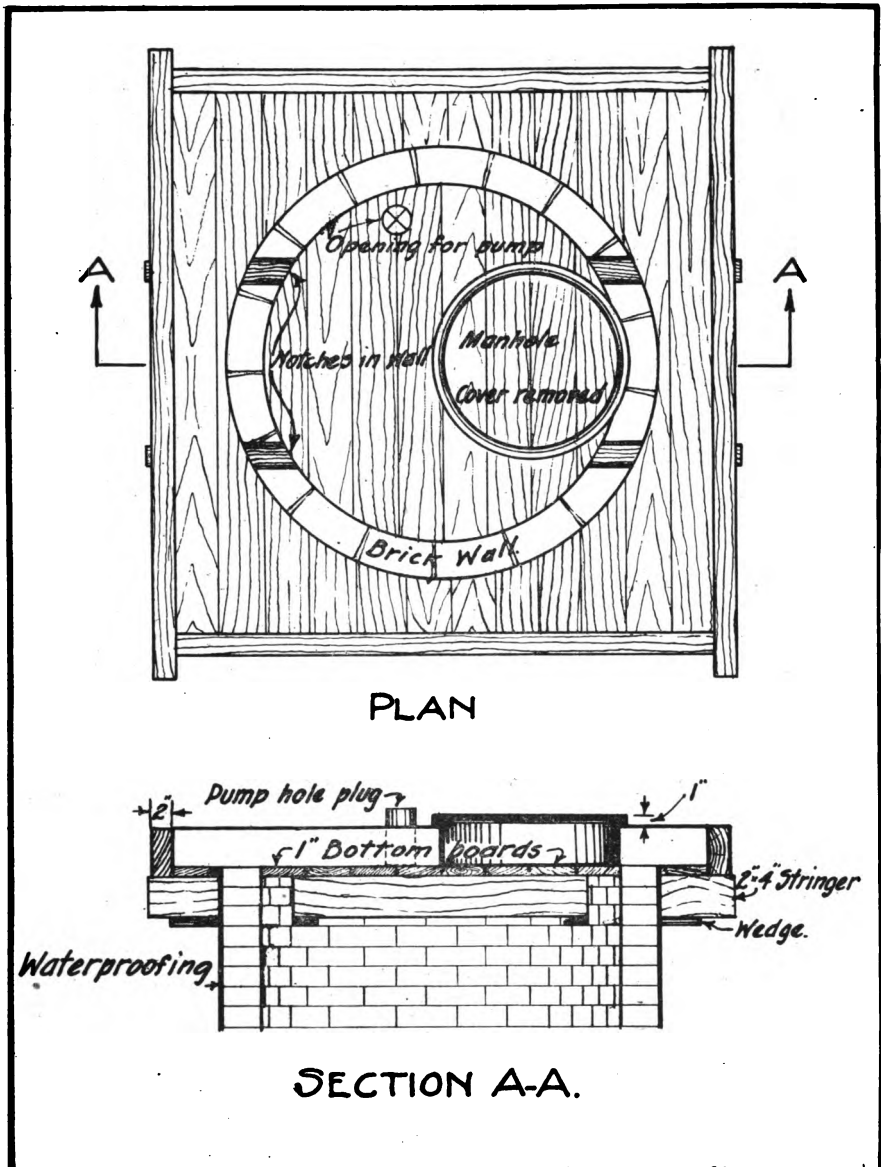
This gives a simple working drawing of form work to be used in providing a dug well with a covering that will not permit the entrance of surface drainage.
